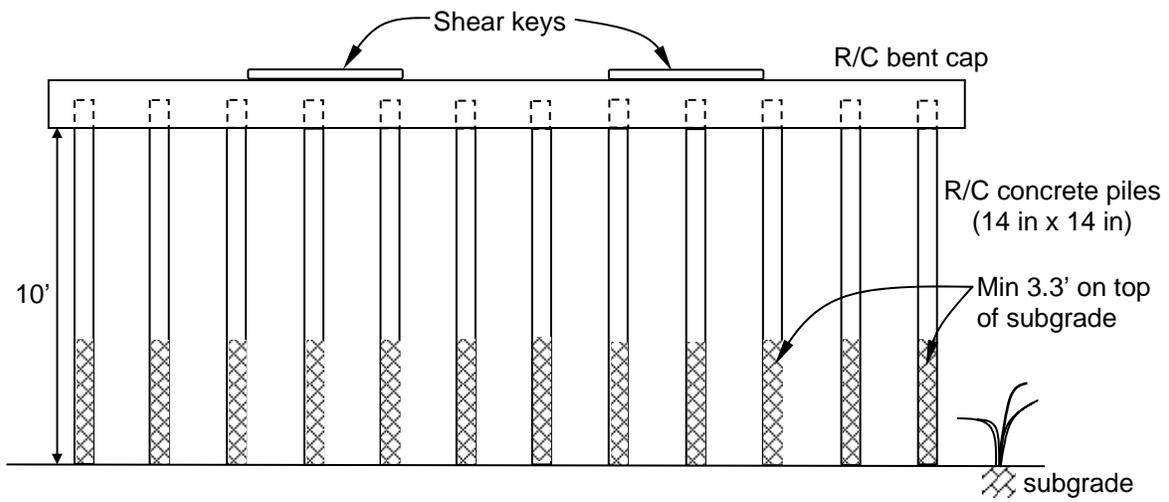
Strengthening of concrete piles (an increase of flexural capacity to 160 k-ft is recommended for all reinforced concrete piles) for the Perkin Creek Channel Change Bridge as one possible option.
